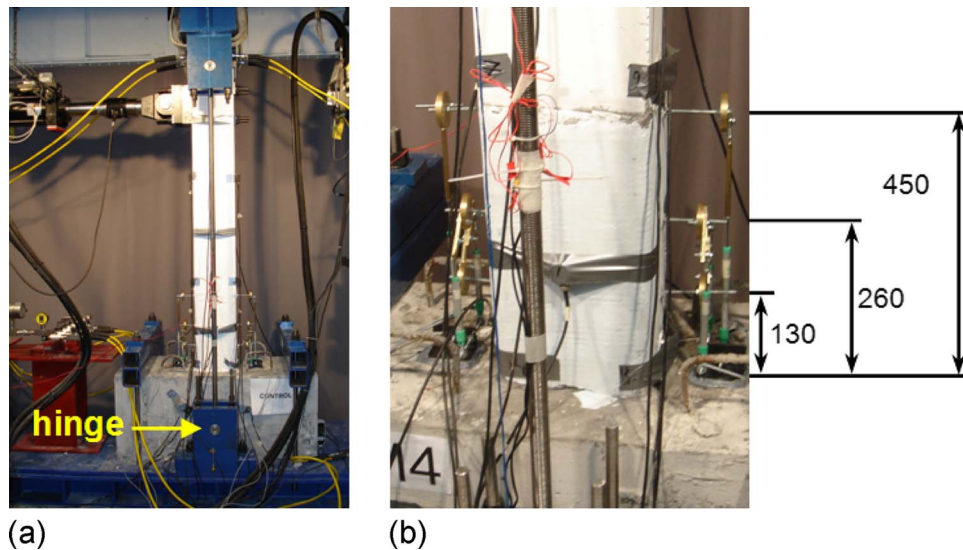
(a) Photograph of test setup; (b) position of displacement transducers (dimensions in millimeter)
